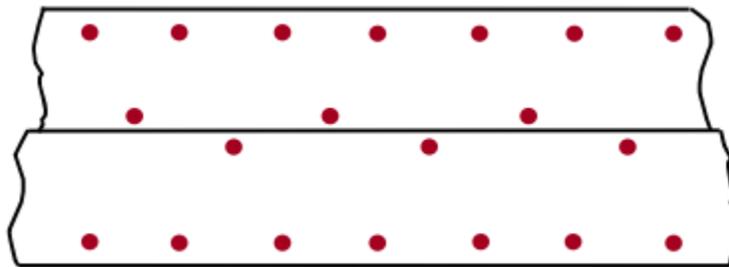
Location of grout holes used when correcting settlement with slab jacking (from Smith et al. 2008)
